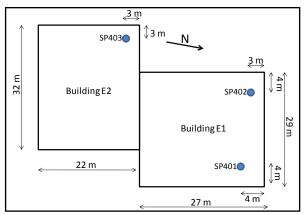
The plan view of the constructed building pads in 2007 and the location of the settlement plates
